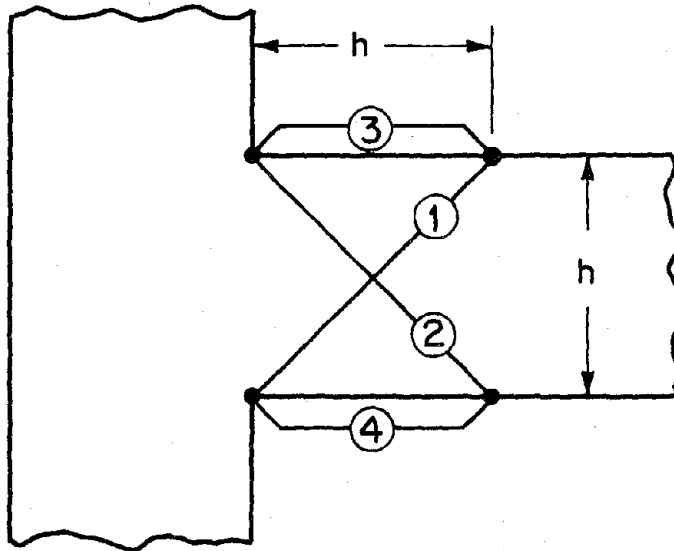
LVDTs Positioned over Beam Hinging Zone.
